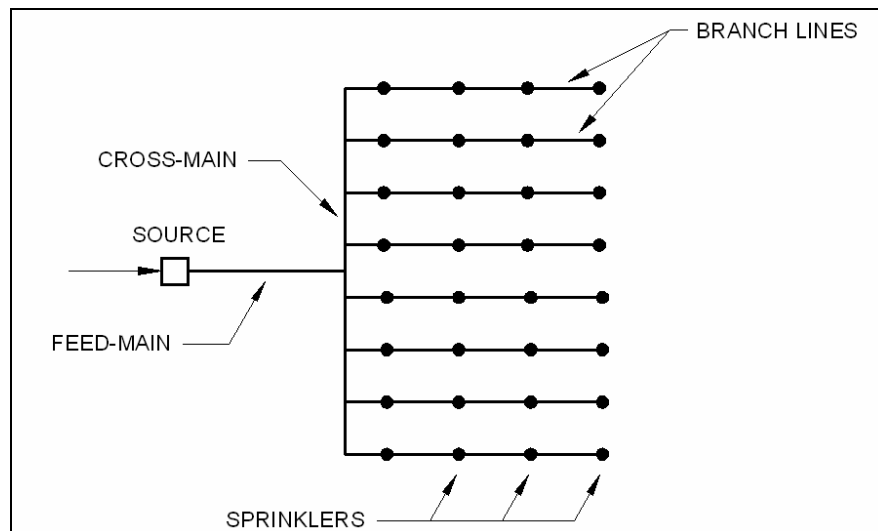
Typical Branched Sprinkler System (Plan View)
